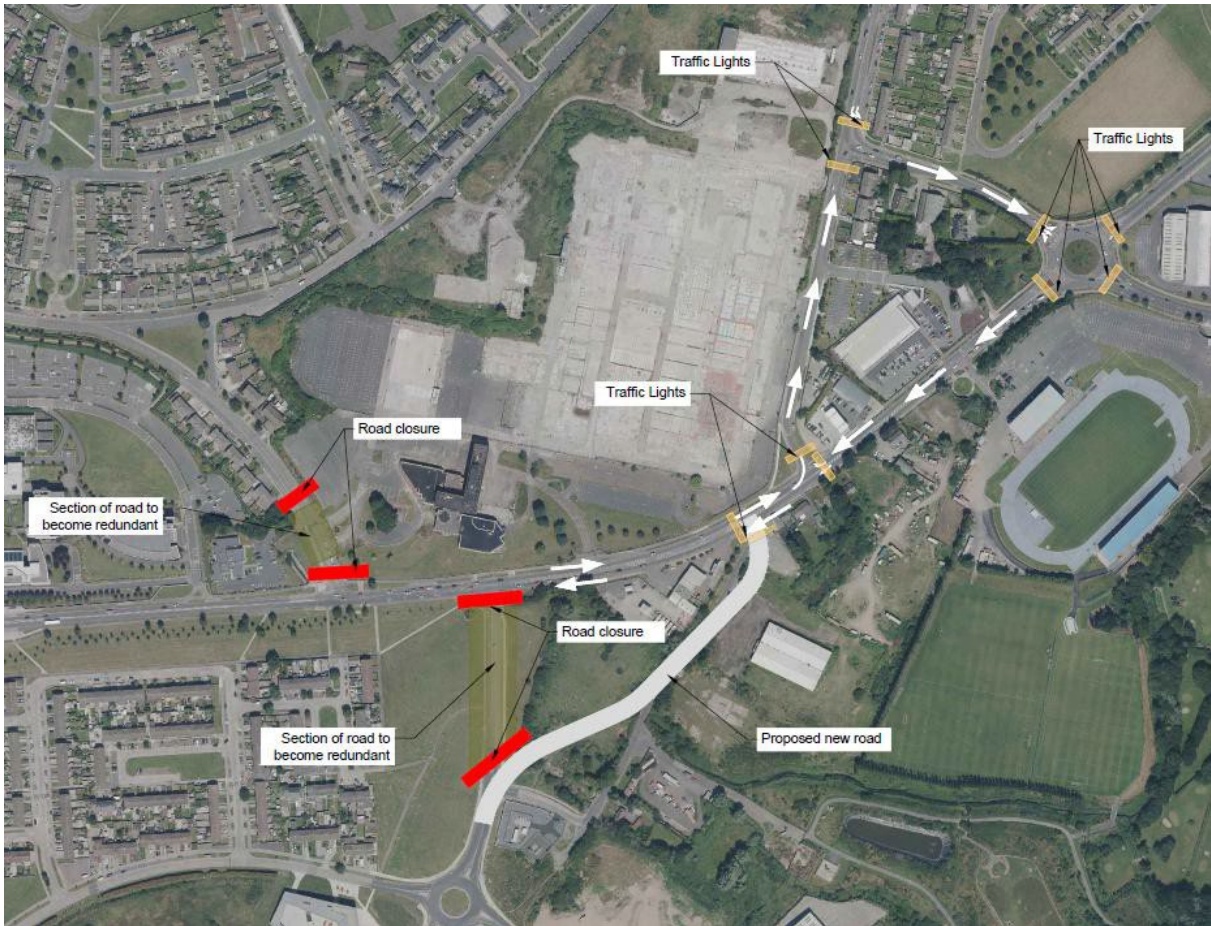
Indicative new junction layout at Cork Road and Kilbarry Road
